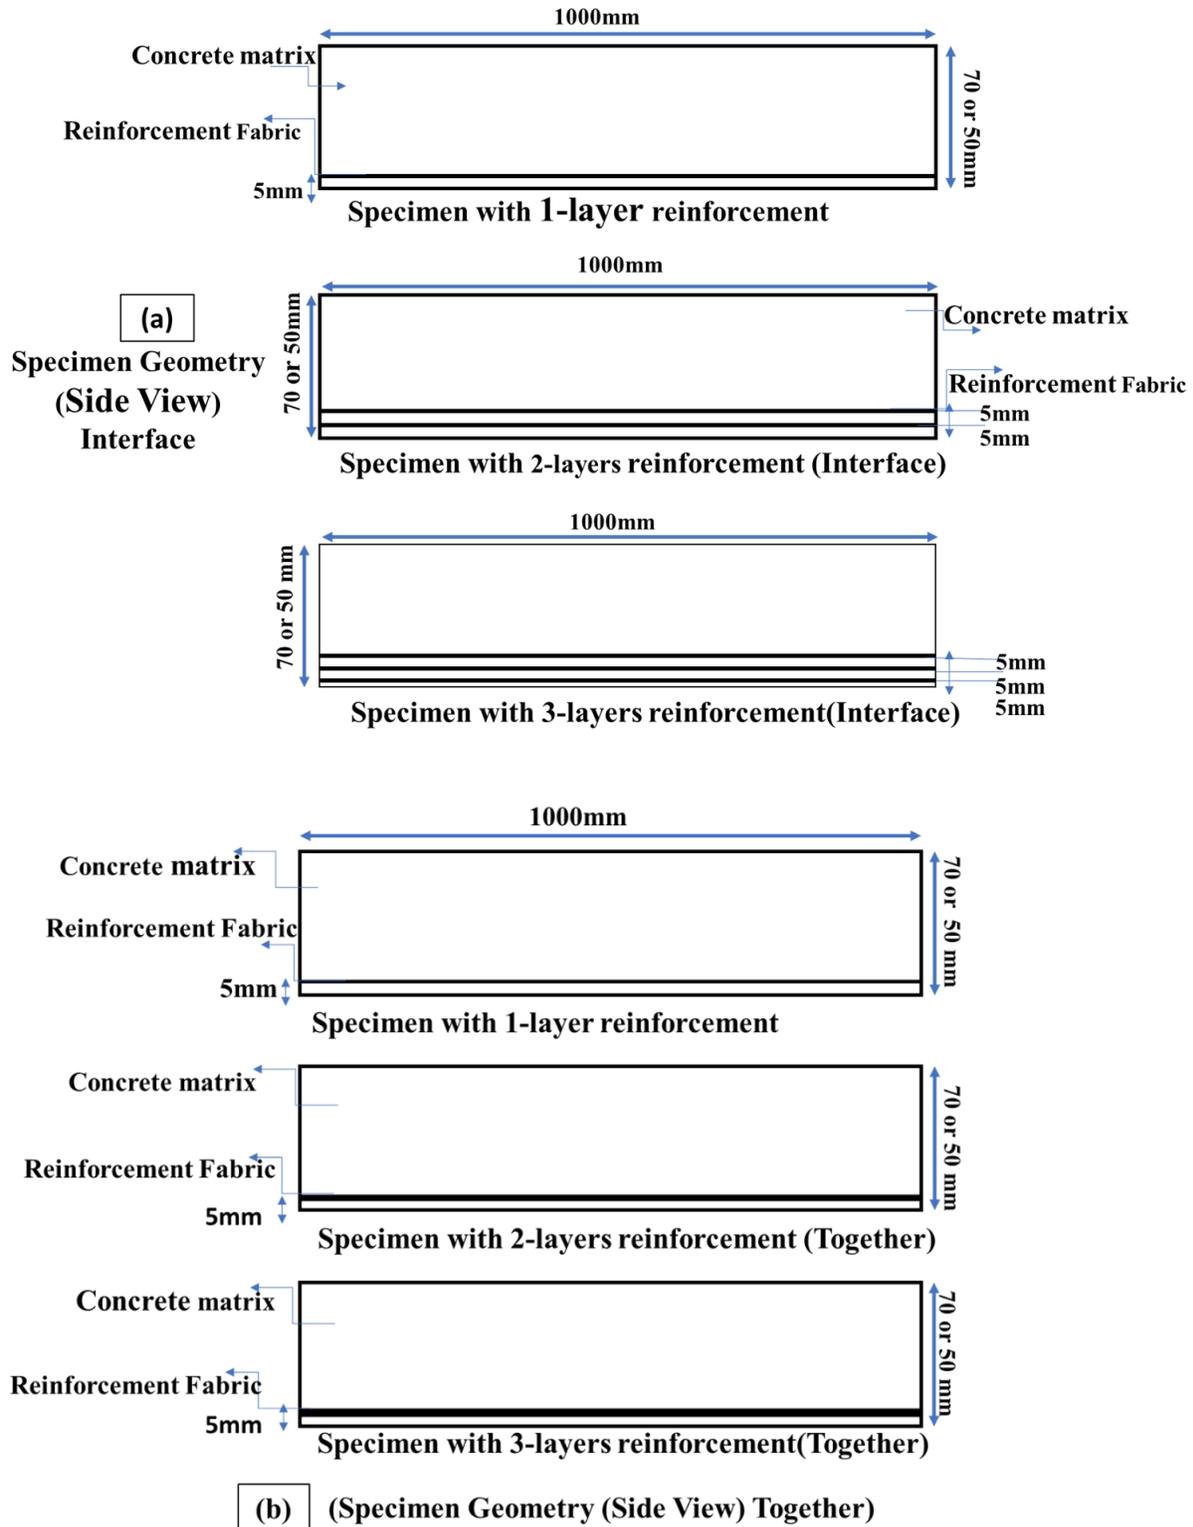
(a) Specimen’s reinforcement and details (side view) interface reinforcement configuration; (b) Specimen’s reinforcement and details (side view), together with reinforcement configuration.
